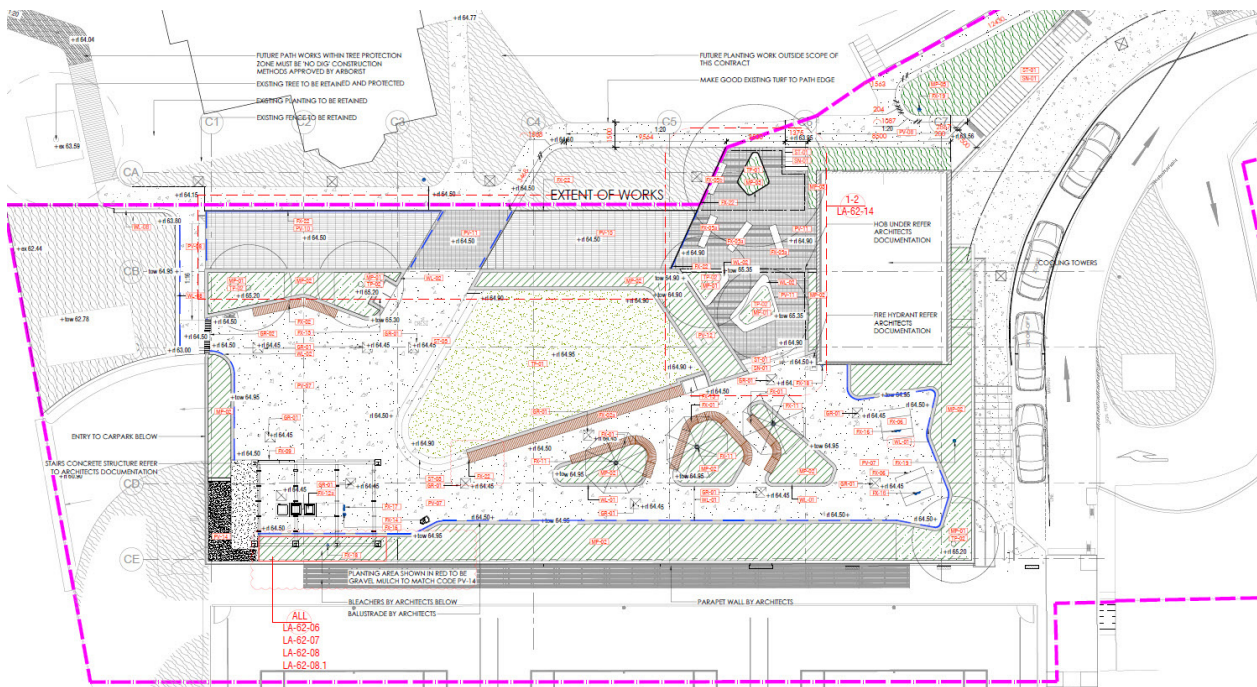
PROPOSED General Arrangement Car Park Roof Top (Source: COX, LA-20-11, Revision 19)
